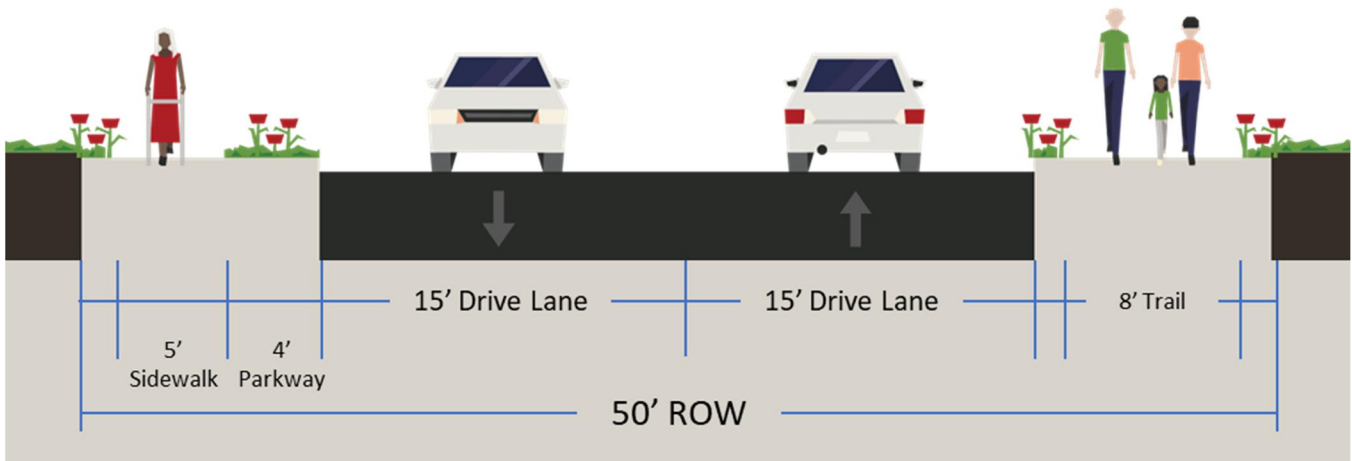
Proposed Cross Section: 2-Lane Undivided Collector (Local/Residential) – Sidewalk vs. Trail Option
